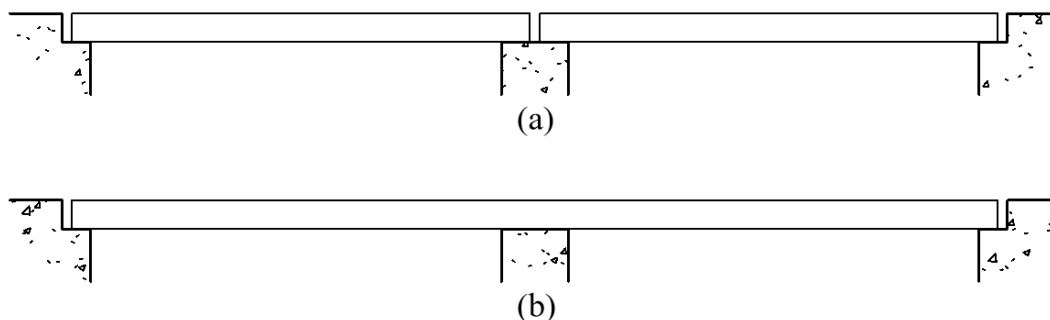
Bridge Geometry with (a) Joint (b) No Joint
